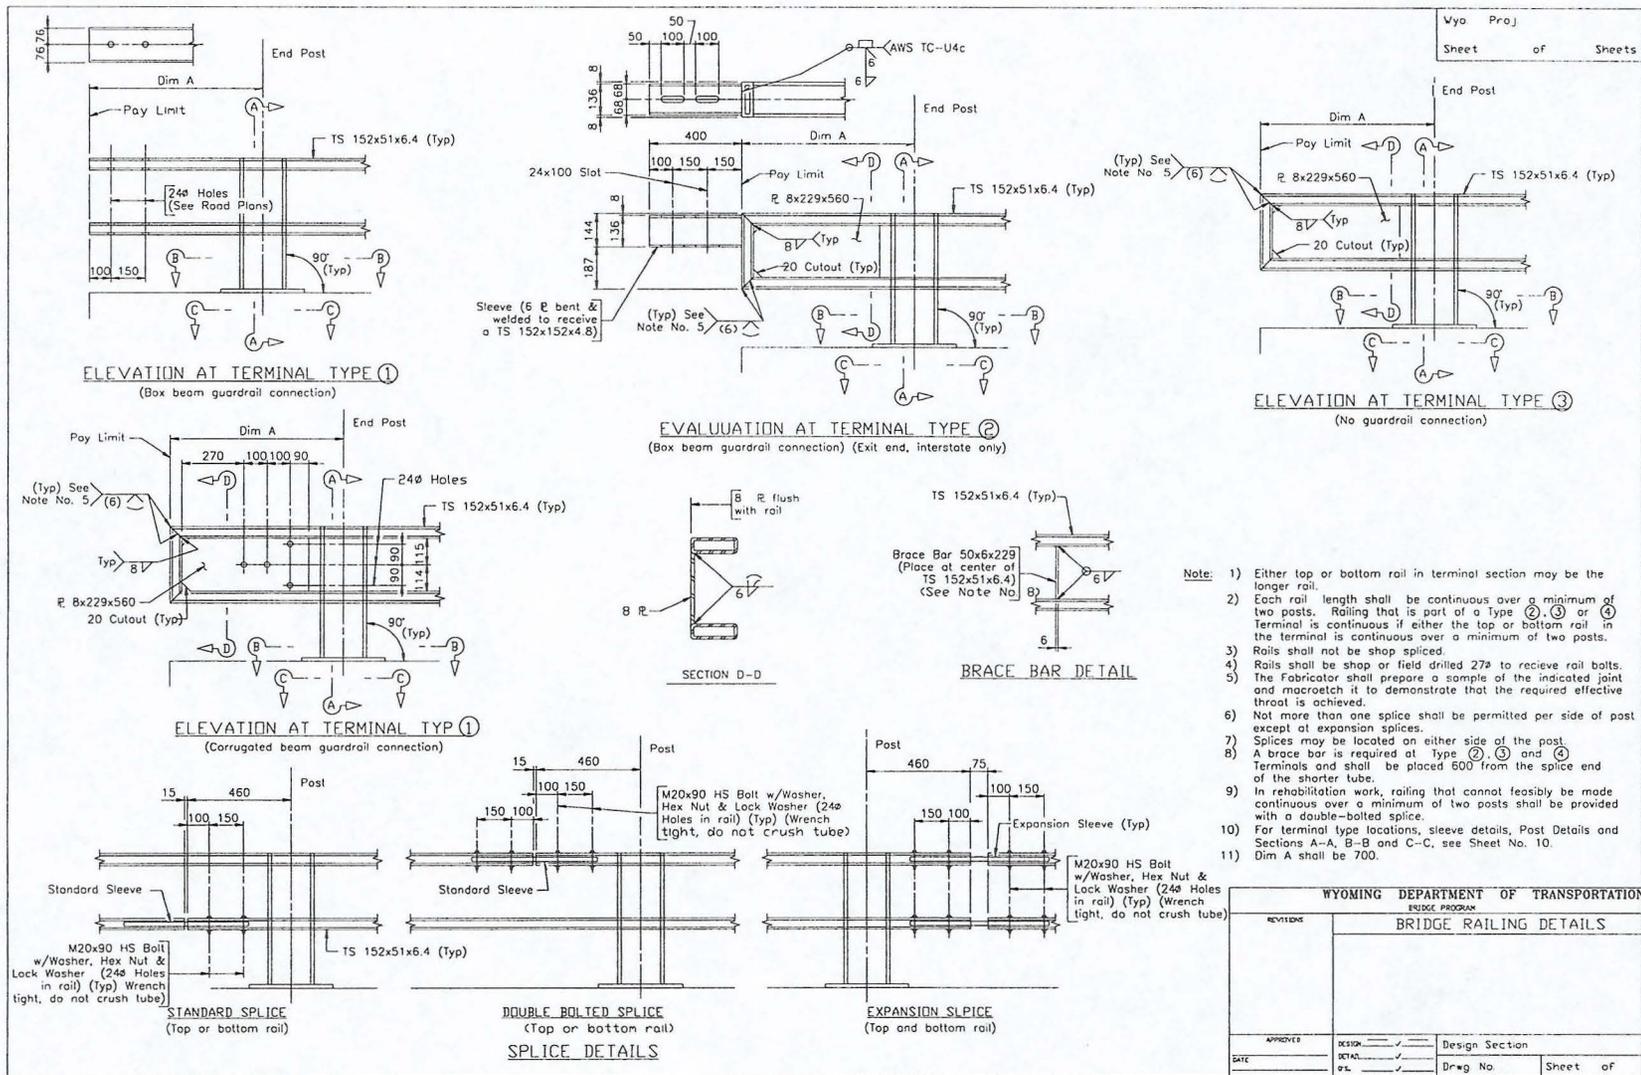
Details of the Wyoming 740WYBRAIL bridge railing elements.
